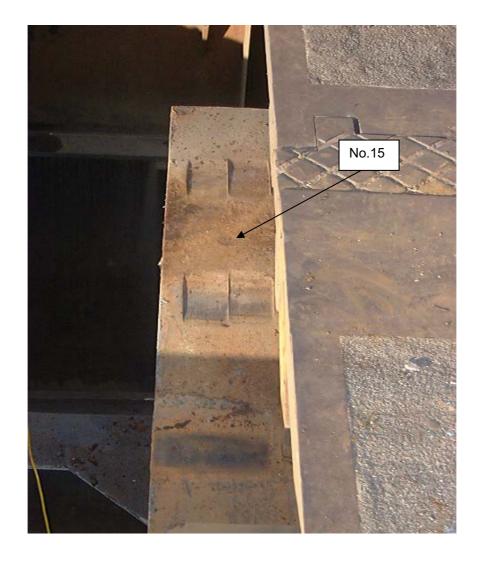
View of a Shuttle Plate Holding Down Pin and Spring
